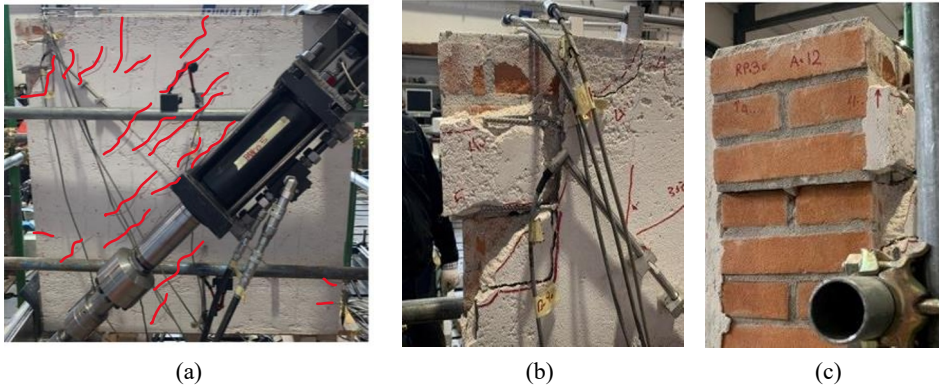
Damage pattern at the end of the test for lime plaster specimen MR2-3-12-L: (a) front, (b) corner and (c) sliding of the masonry bricks.
